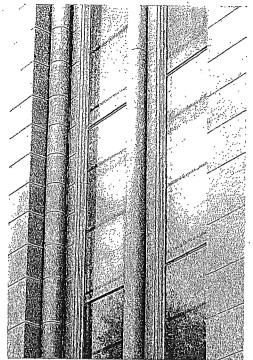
West tower, north window after restoration (Rich Stapleton, 05/21/2018).
